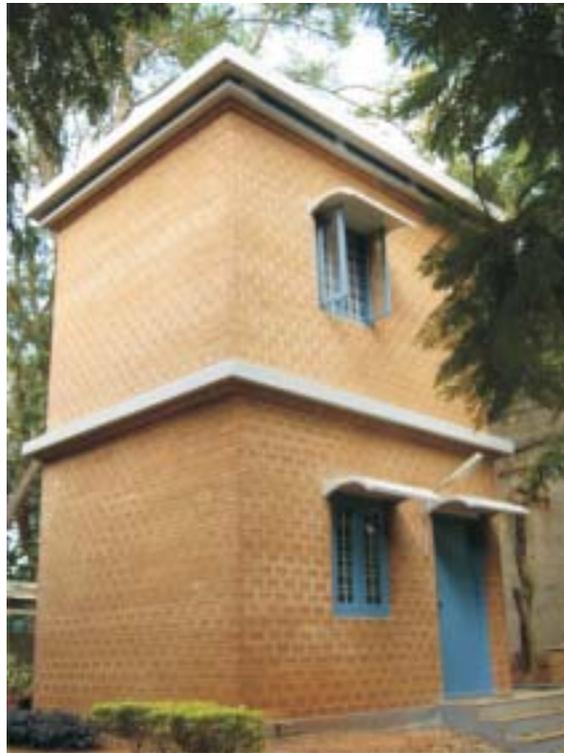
Two storey load bearing masonry building was constructed using iron tailings as fine aggregate at IISc Bangalore.
